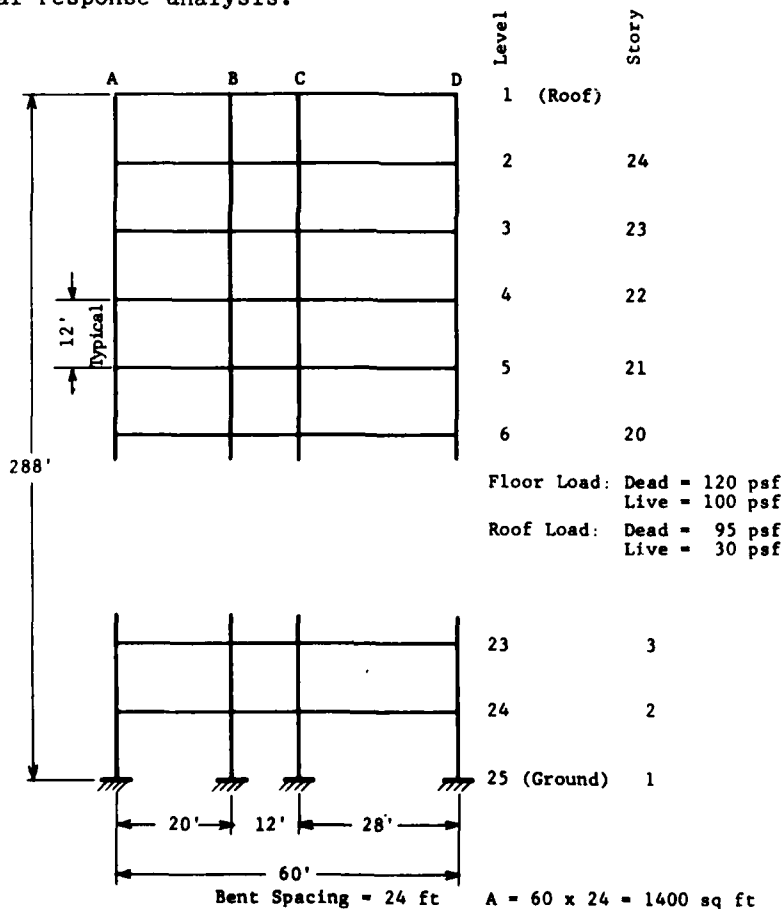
24-STORY BUILDING - FRAME C (unbraced) Ref. [2]
